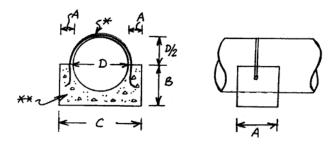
Counterweight Details for Pipes Subject to Uplift Forces
